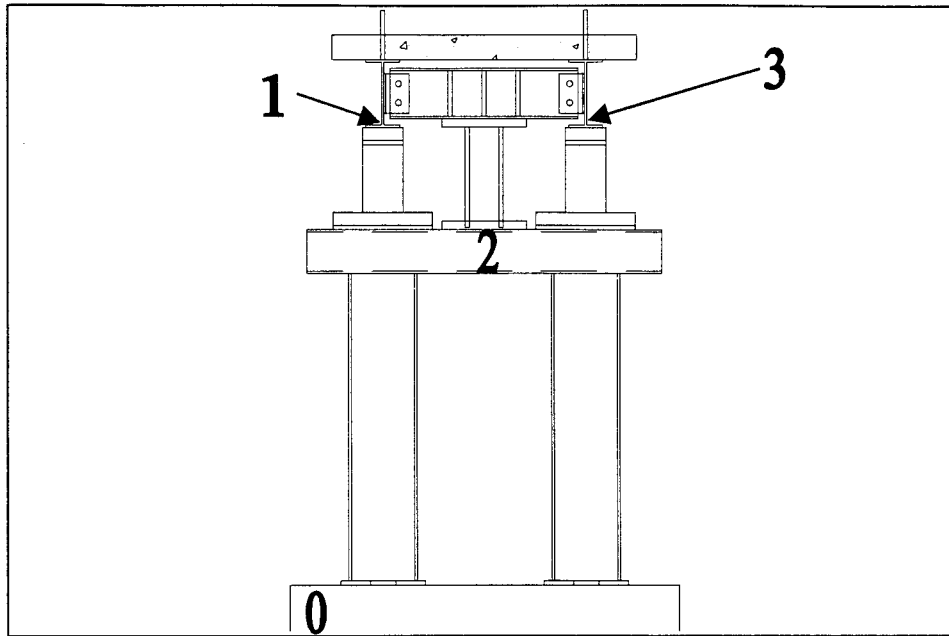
Accelerometer Location on Small-Scale Bridge
